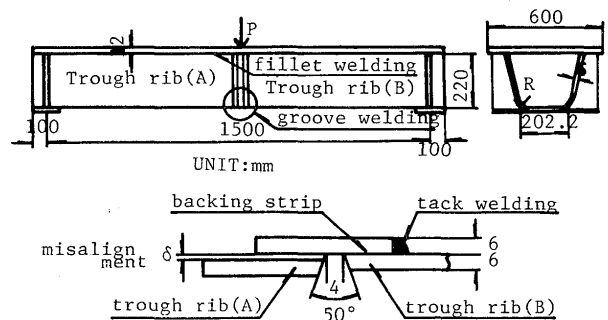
Bending fatigue specimen of closed U-shaped trough rib.
